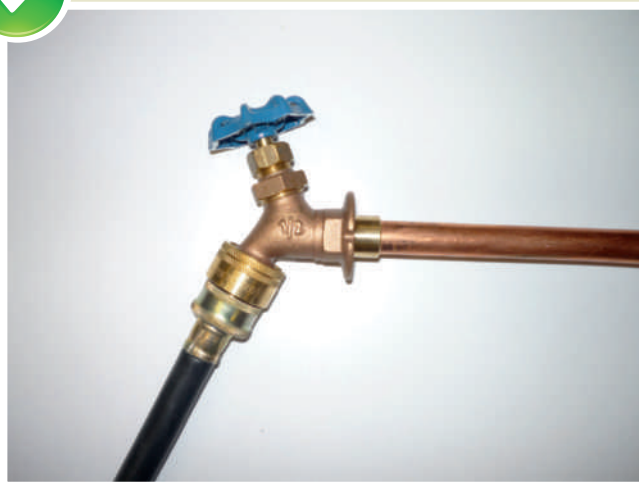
This photograph shows a vacuum breaker threaded over the hose outlet. Notice that the hose is connected to the vacuum breaker and not directly to the bibb as in Figure 7-40.
